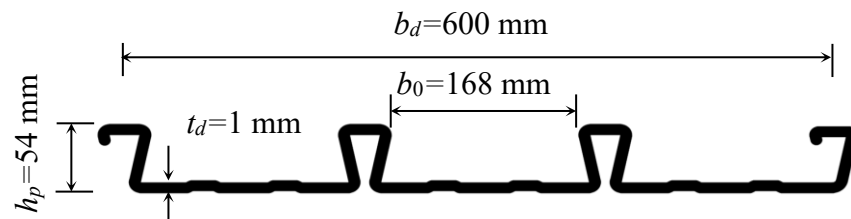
Details of profiled steel decking – 1 mm-thick Lysaght® bondek® II (unit: mm)
